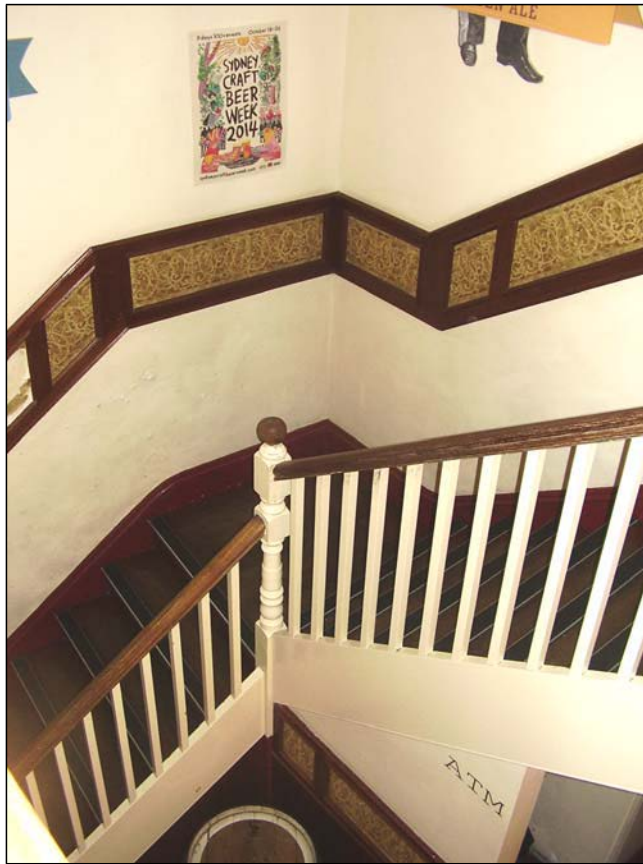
The stair was constructed as part of the 1990s works and has timber treads and risers and balustrade.
